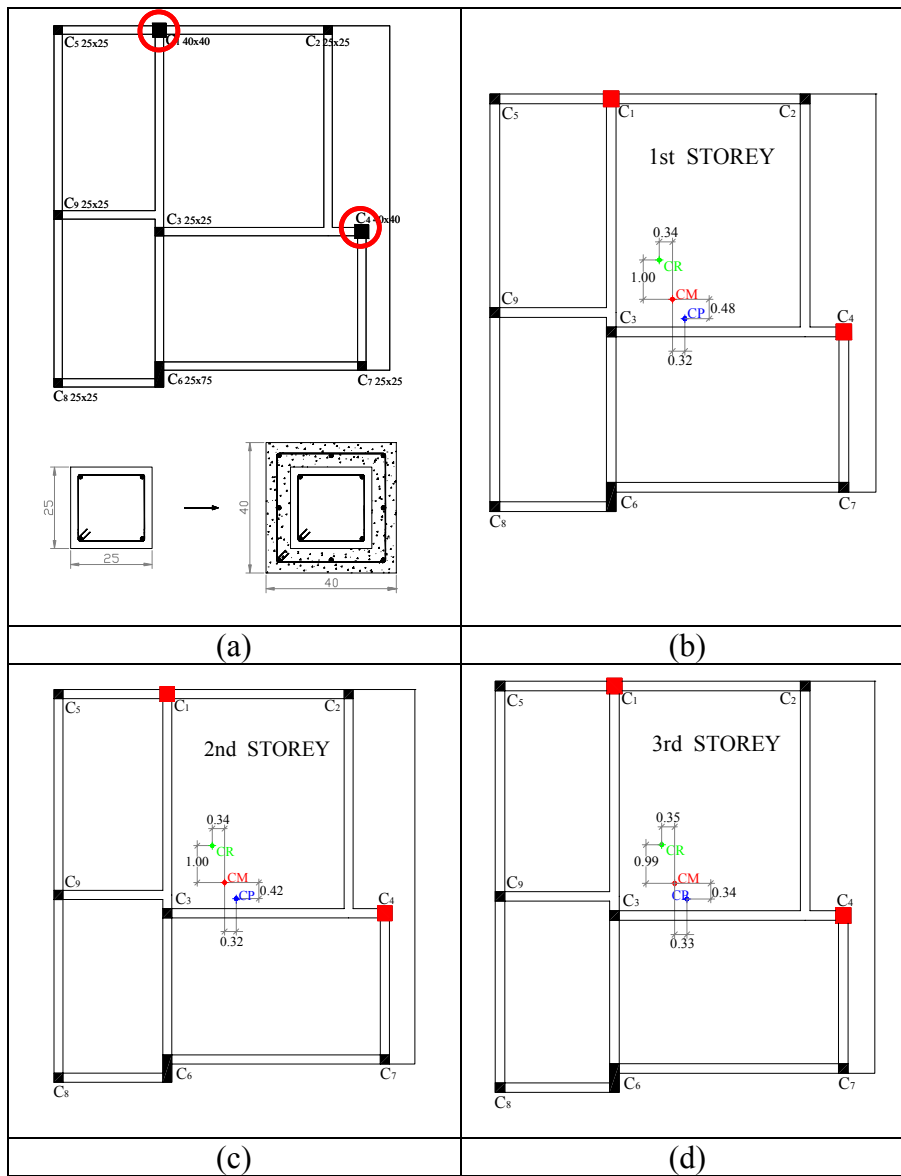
RC rehabilitated structure: Plan layout and cross section enlargement (a), centre of stiffness and strength eccentricity at 1st (b), 2nd storey (c) and 3rd storey (d)
